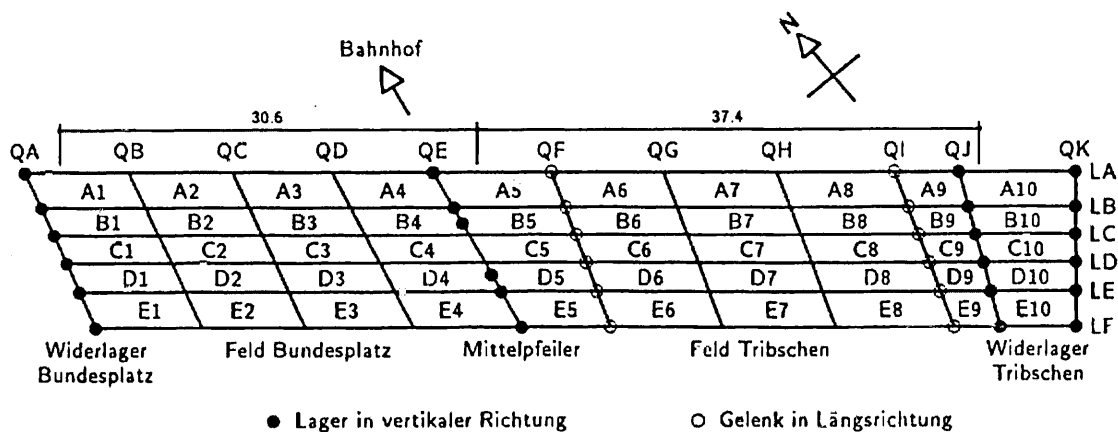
Plan view of bridge deck, showing girder arrangement, hinges and supports
